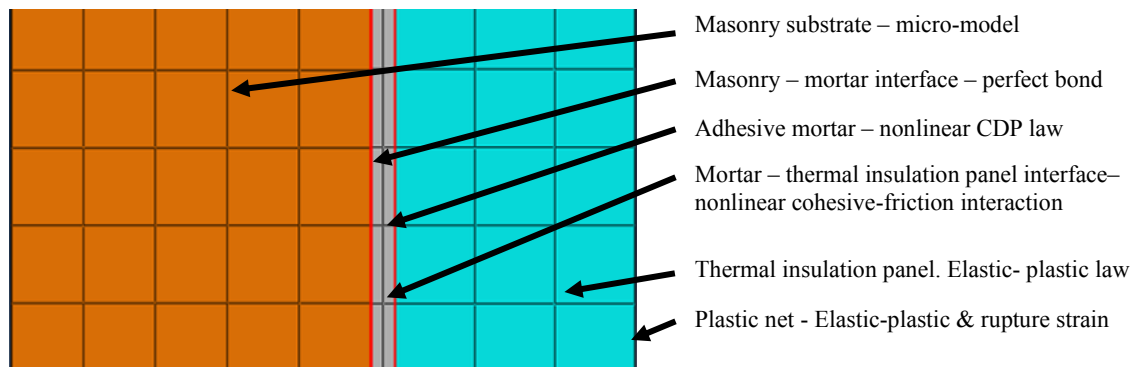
Cross-section of a masonry wall and a thermal insulation of the employed numerical model.
